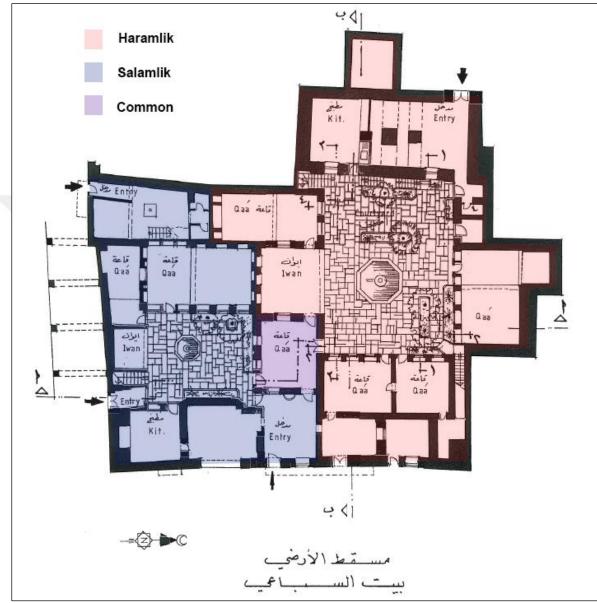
The Ground Floor Plan of Al-Sibaei House
